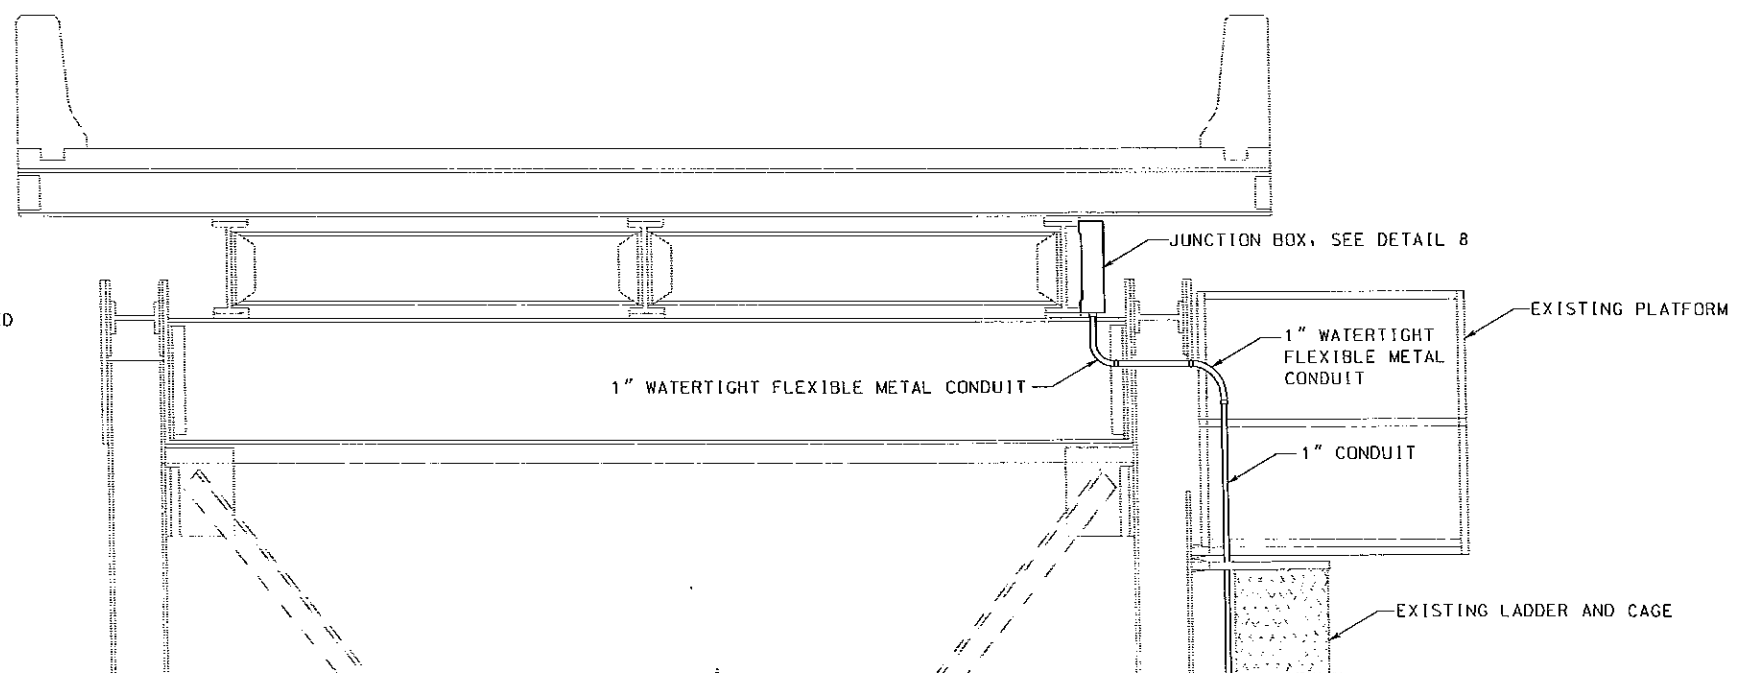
JUNCTION BOX ATTACHMENT TO GIRDER SECTION OF THE NMB
